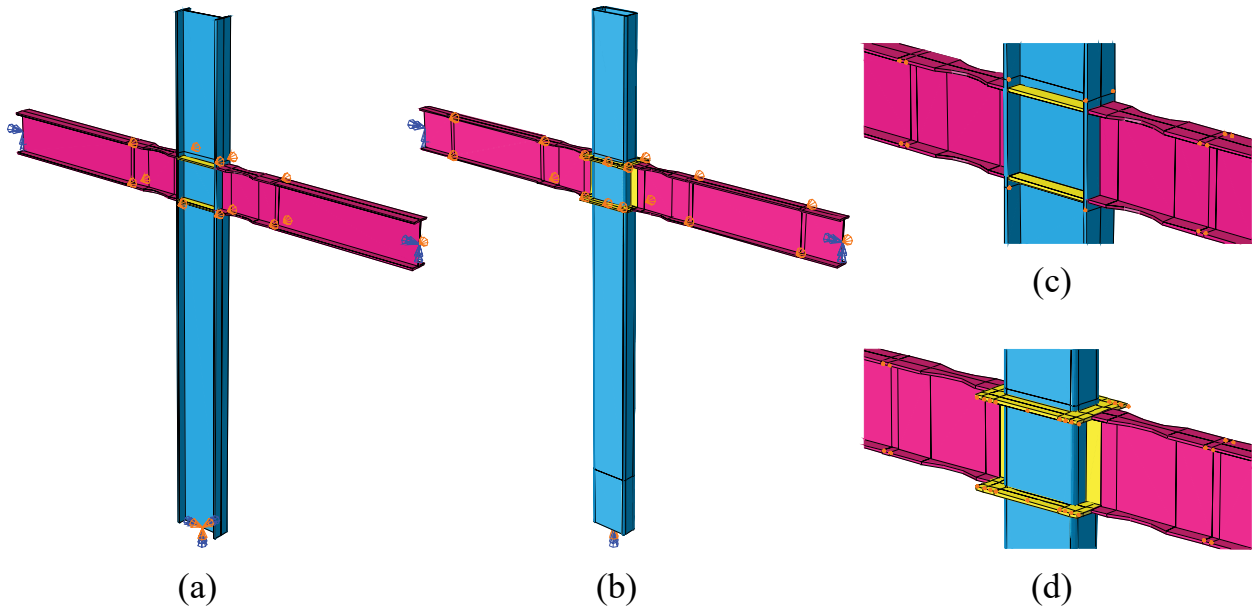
Finite element models of the (a and c) wide flange column and (b and d) HSS column subassemblies.
